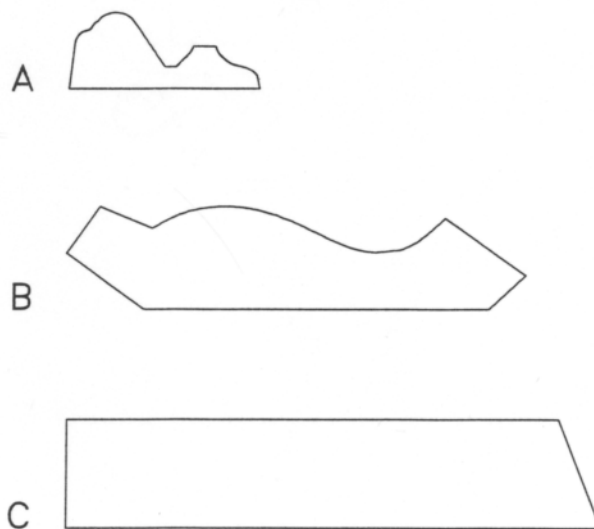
Details of trim found in the Williamson House, 1995. Details A and B are from the fireplace mantel, C is the door trim.
